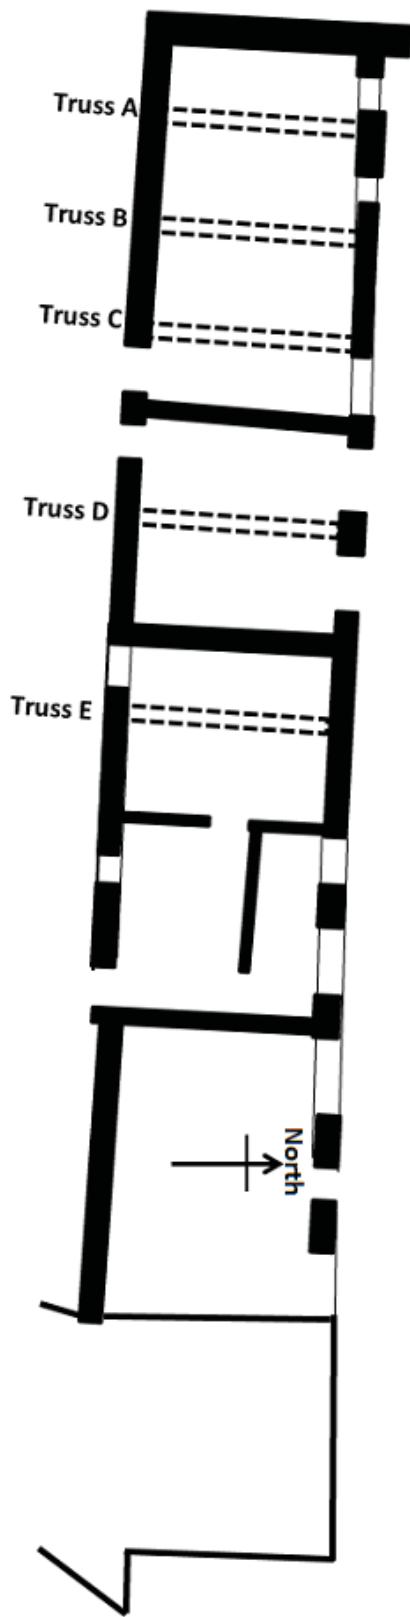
Simplified ground floor plan of 7-12 Church Street to show layout of the building and the position of the cruck truss (after Elden Minns & Co Ltd, Surveyors)
